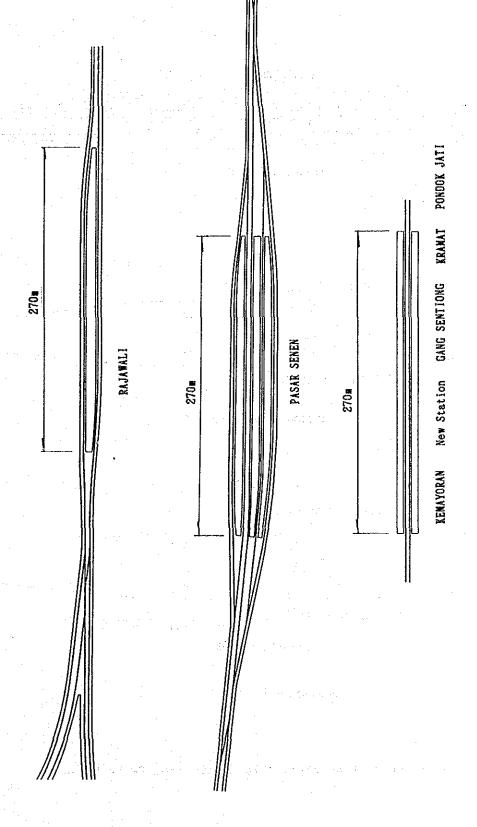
Track Layout Plan of Station Yard
